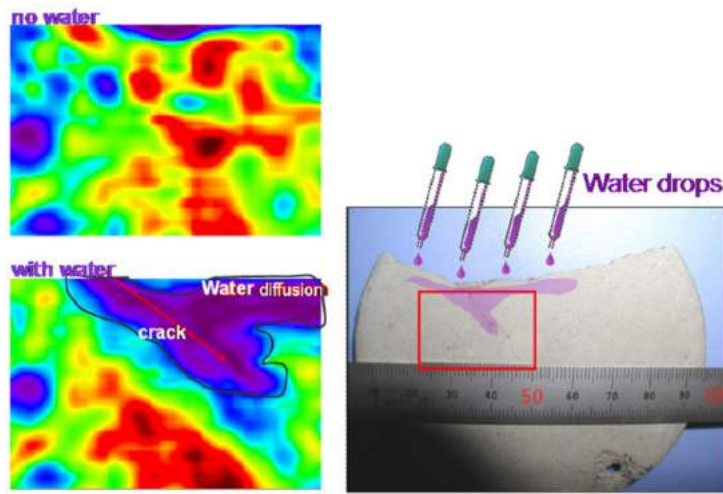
Terahertz image of water infiltrating in a concrete crack. Adapted from [17].
